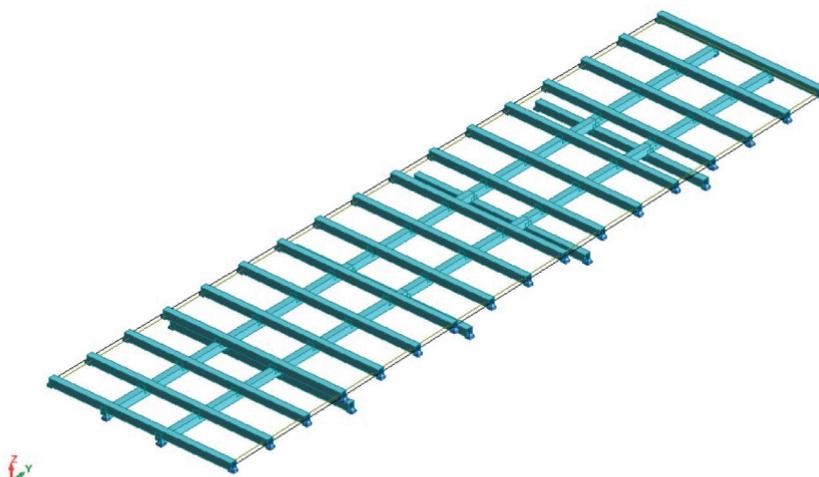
Calculated model of the ceiling in the “Fireplace” room
